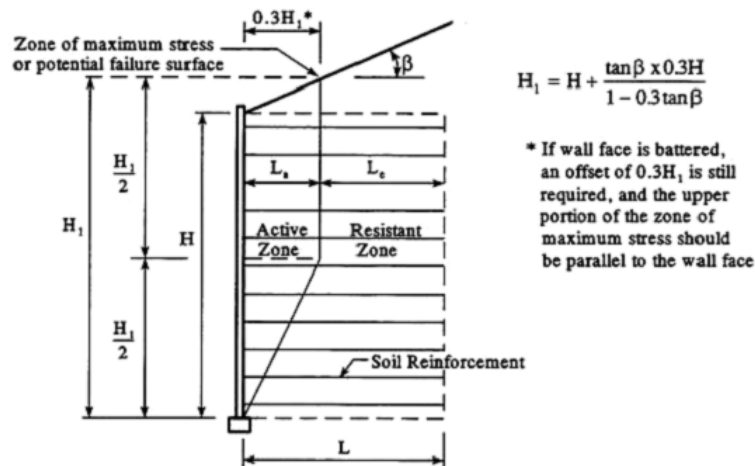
Location of Assumed Failure Surface for Inextensible Reinforcement (FHWA, 2009).
